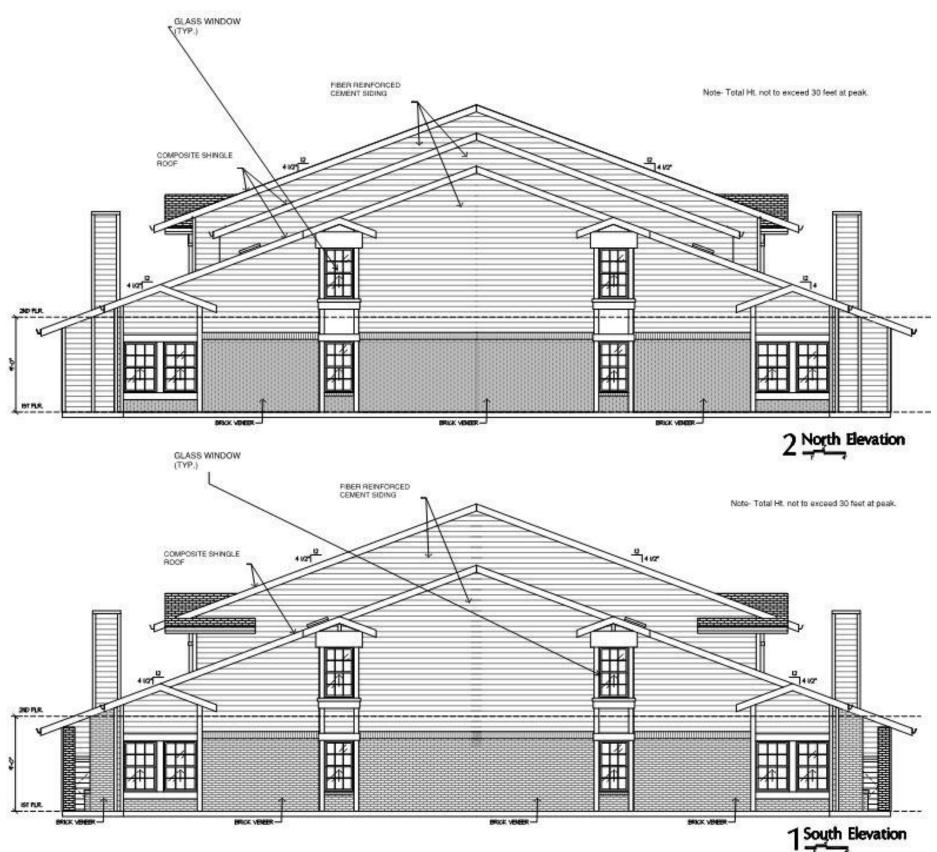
EXTERIOR ELEVATIONS See Exhibit F2 for Special Note
